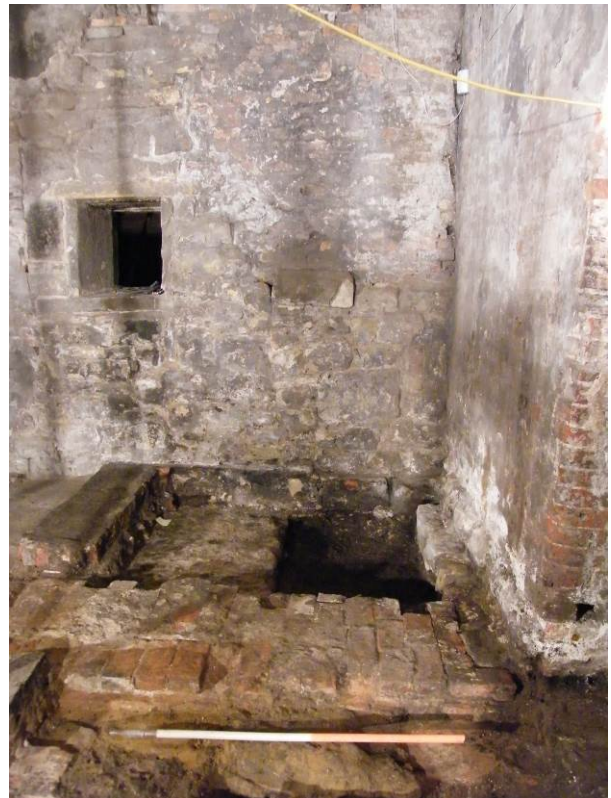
Area of base of stair, looking east; the walling above preserves the diagonal silhouette of part of the stair timberwork superstructure
